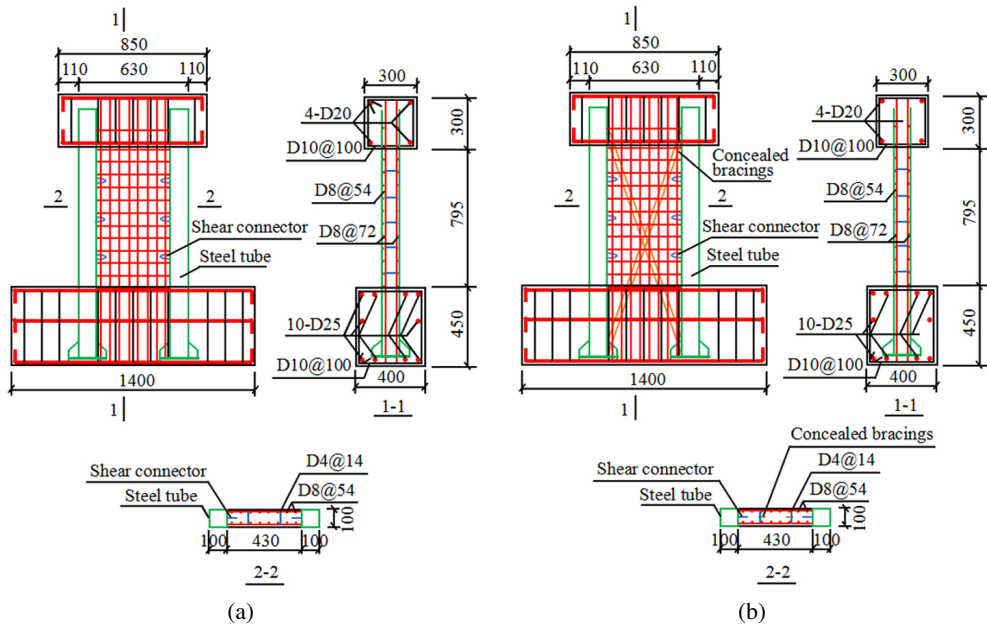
Dimensions and reinforcement details of specimens (units: mm): (a) Vertical view of specimen TSW1 ~ TSW3, (b) Vertical view of specimen TZSW1 ~ TZSW3
